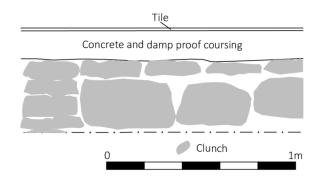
South facing section of the internal south aisle excavation (scale 1:20)
